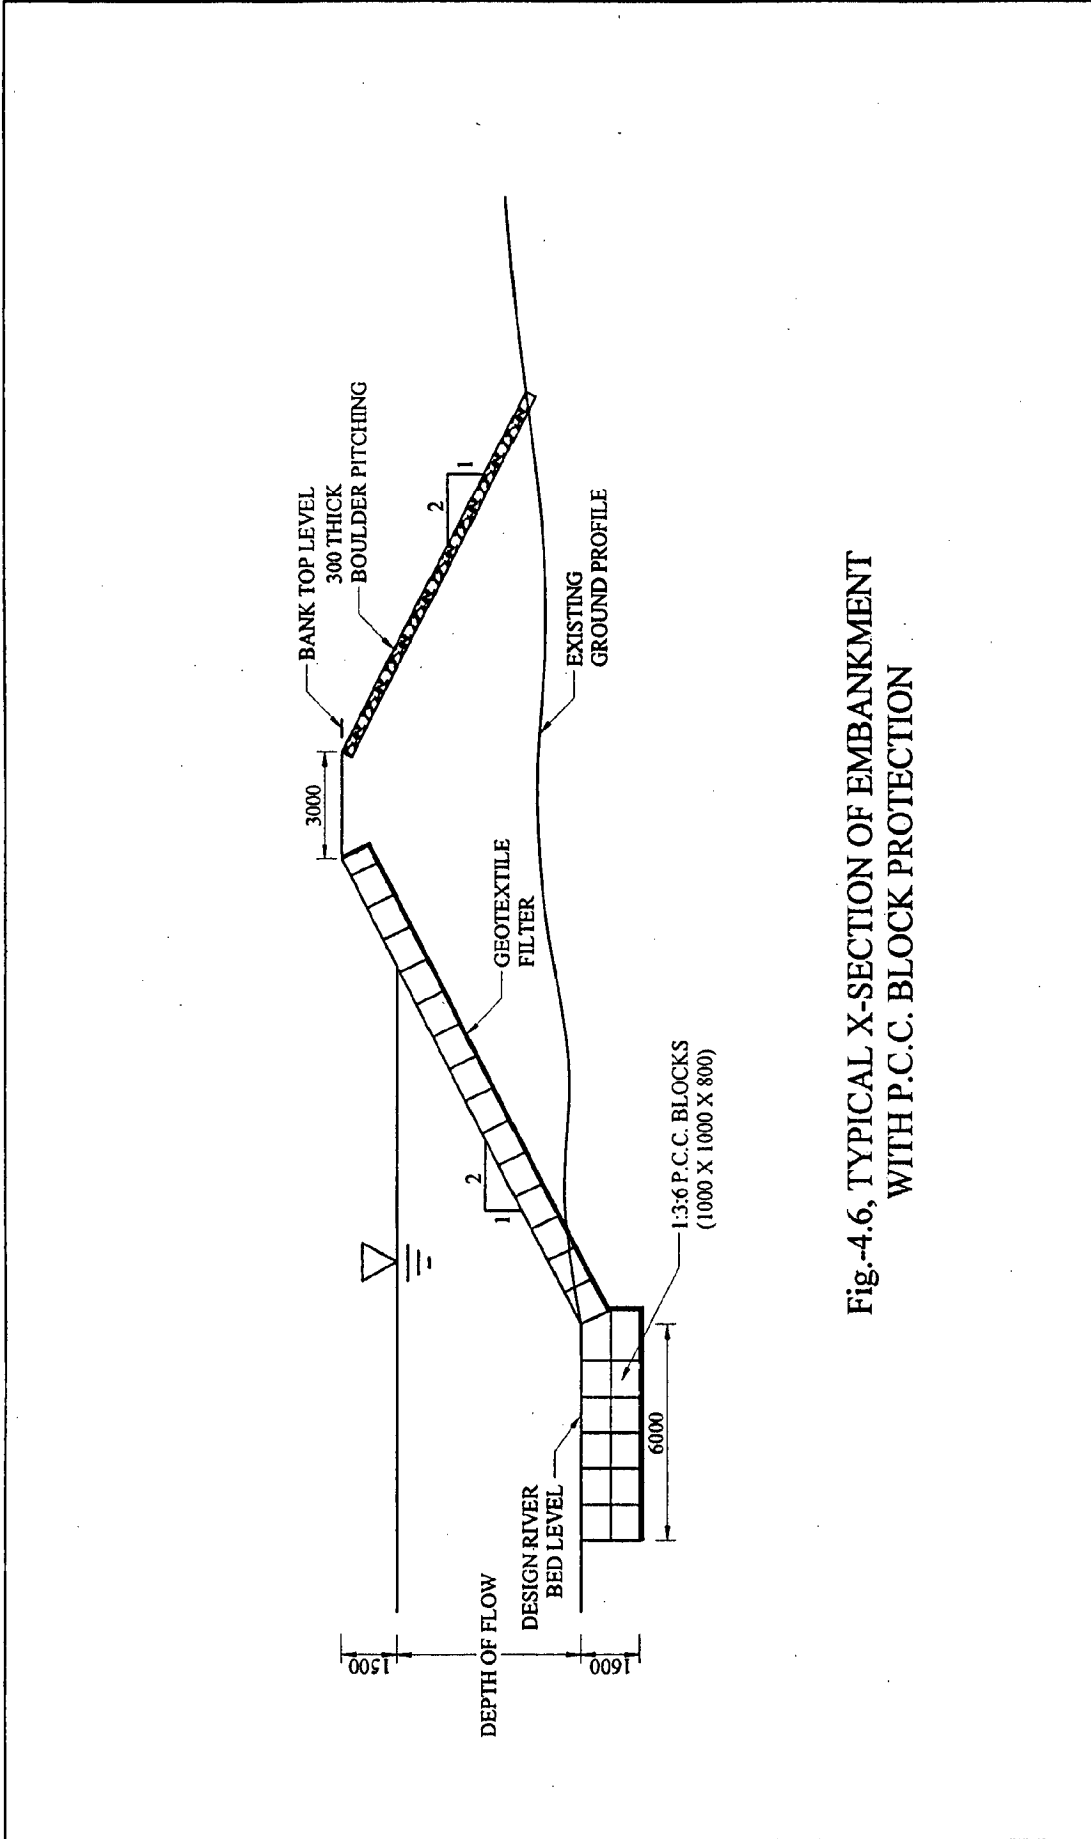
, TYPICAL X-SECTION OF EMBANKMENT
